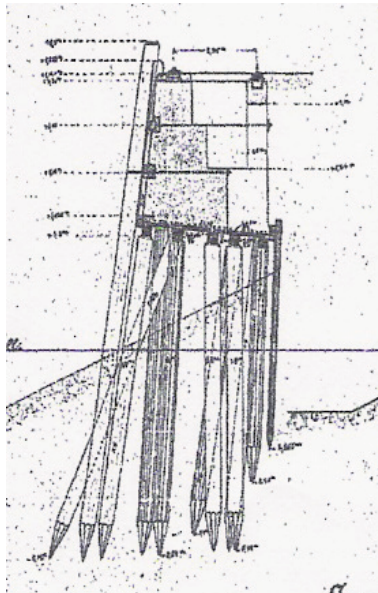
Cross-section of a wooden piled structure with a poured concrete element on top. Hamburg 1866 [Miller 2007]
